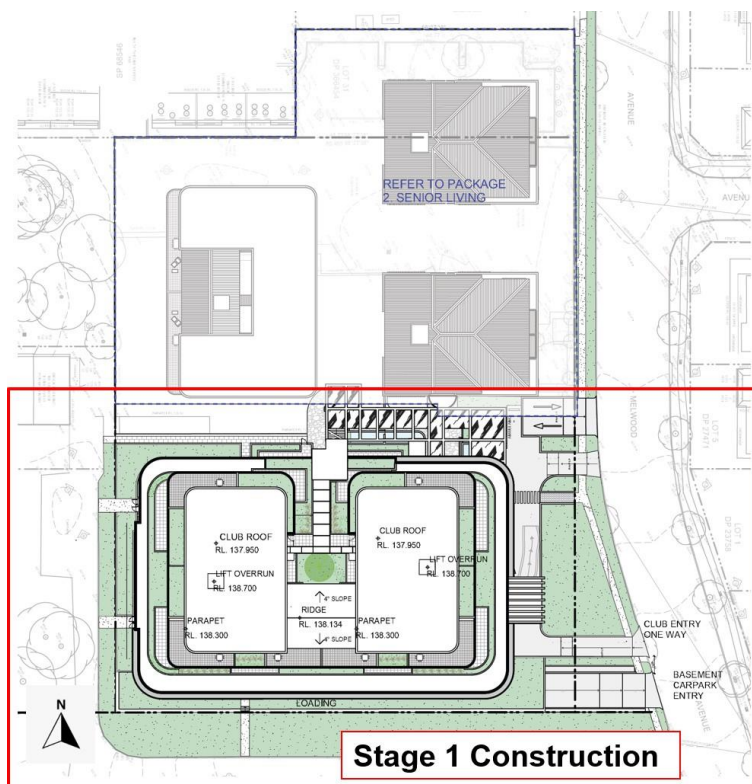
Extract from Site Plan showing Stage 1 Construction for the Registered Club Building / Seniors Housing Mixed Use Building
